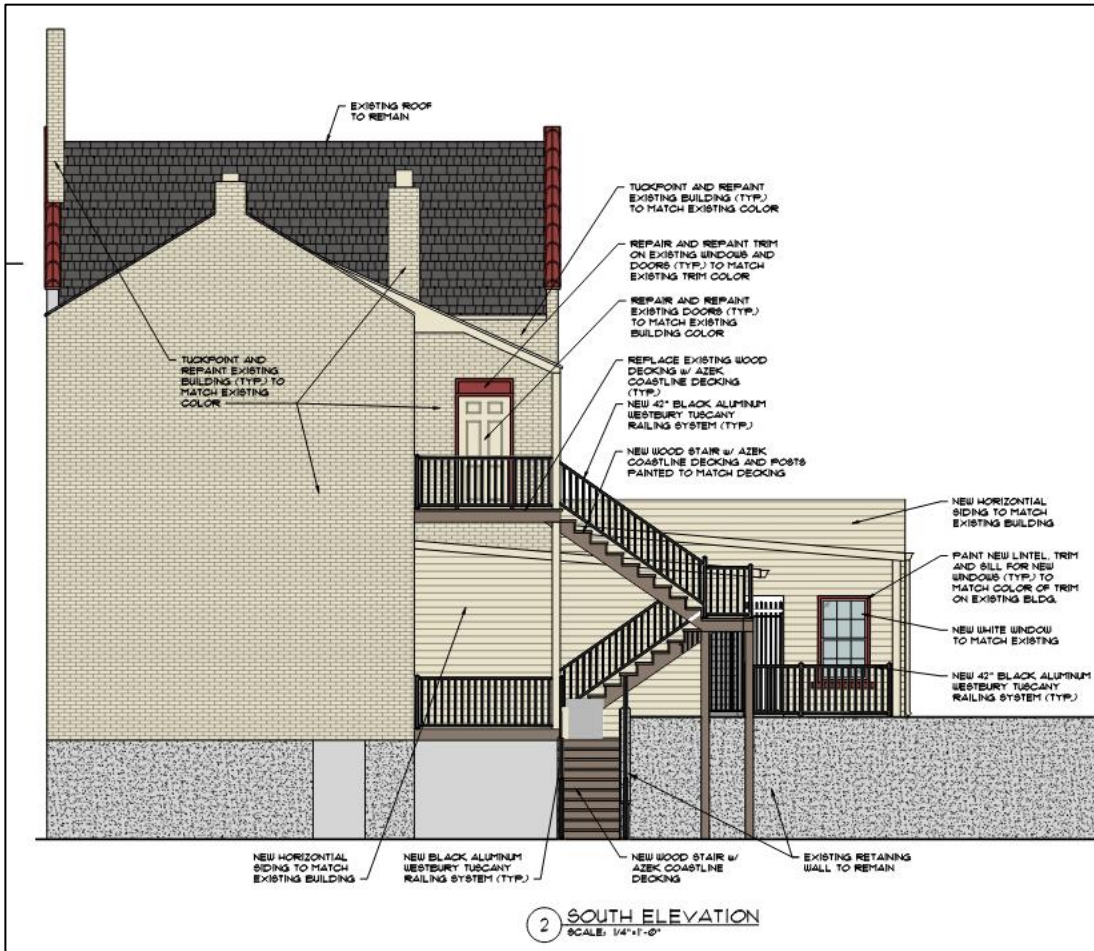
South elevation showcasing the rear of the addition and the proposed alterations to existing stairs/upper porch.
